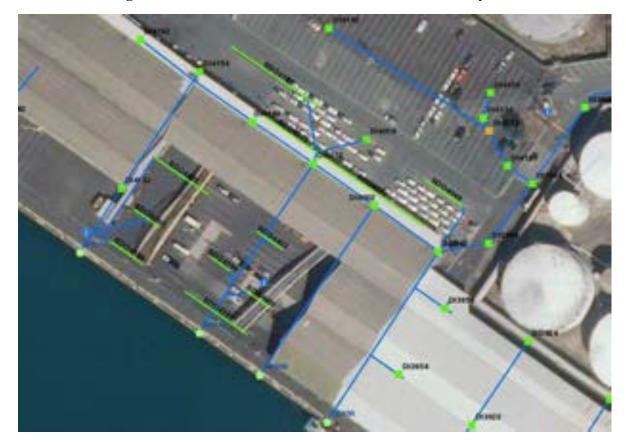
Pier 31 Shed Demolition Storm Sewer System
